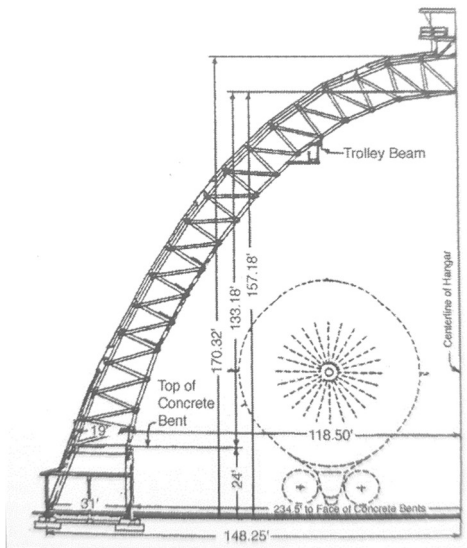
Diagram of truss connection, detail from exhibit inside of the Tillamook Air Museum.³³
